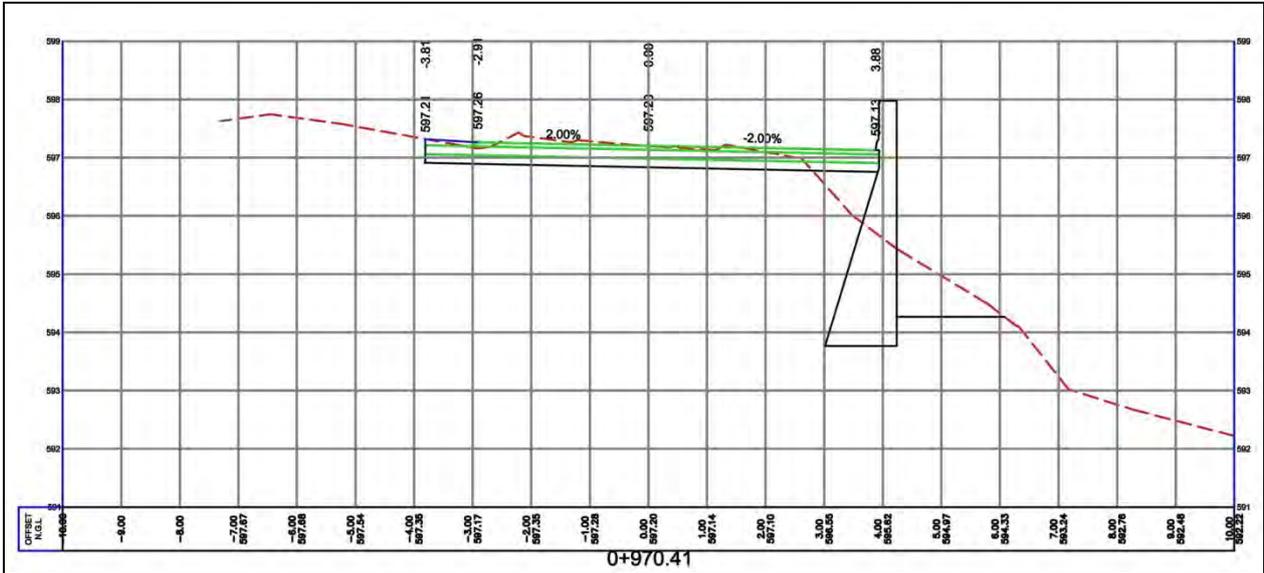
Project 03- SSC- Typical cross section at St. 0+970.41.
